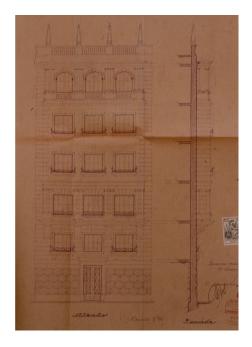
House Teresa Magarolas /Fernando Pons Prats – José María Monravá López, 1 June 1946. Front view. Rambla Nova, 3 (AHMT)
